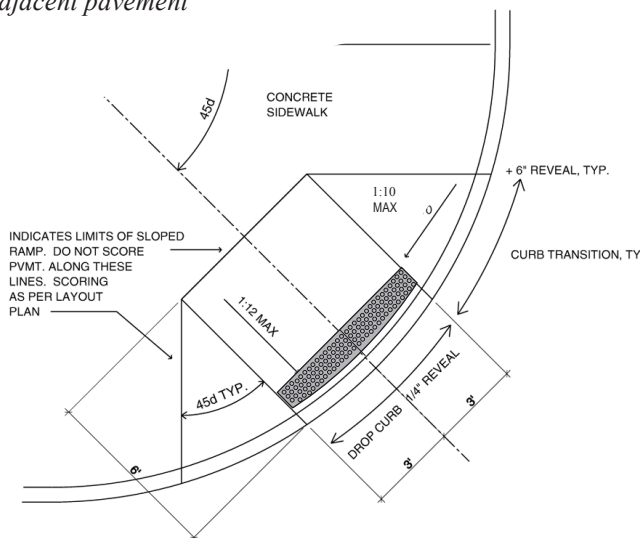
Plan drawing of typical curb ramp at a radiused intersection with detectable warning area
